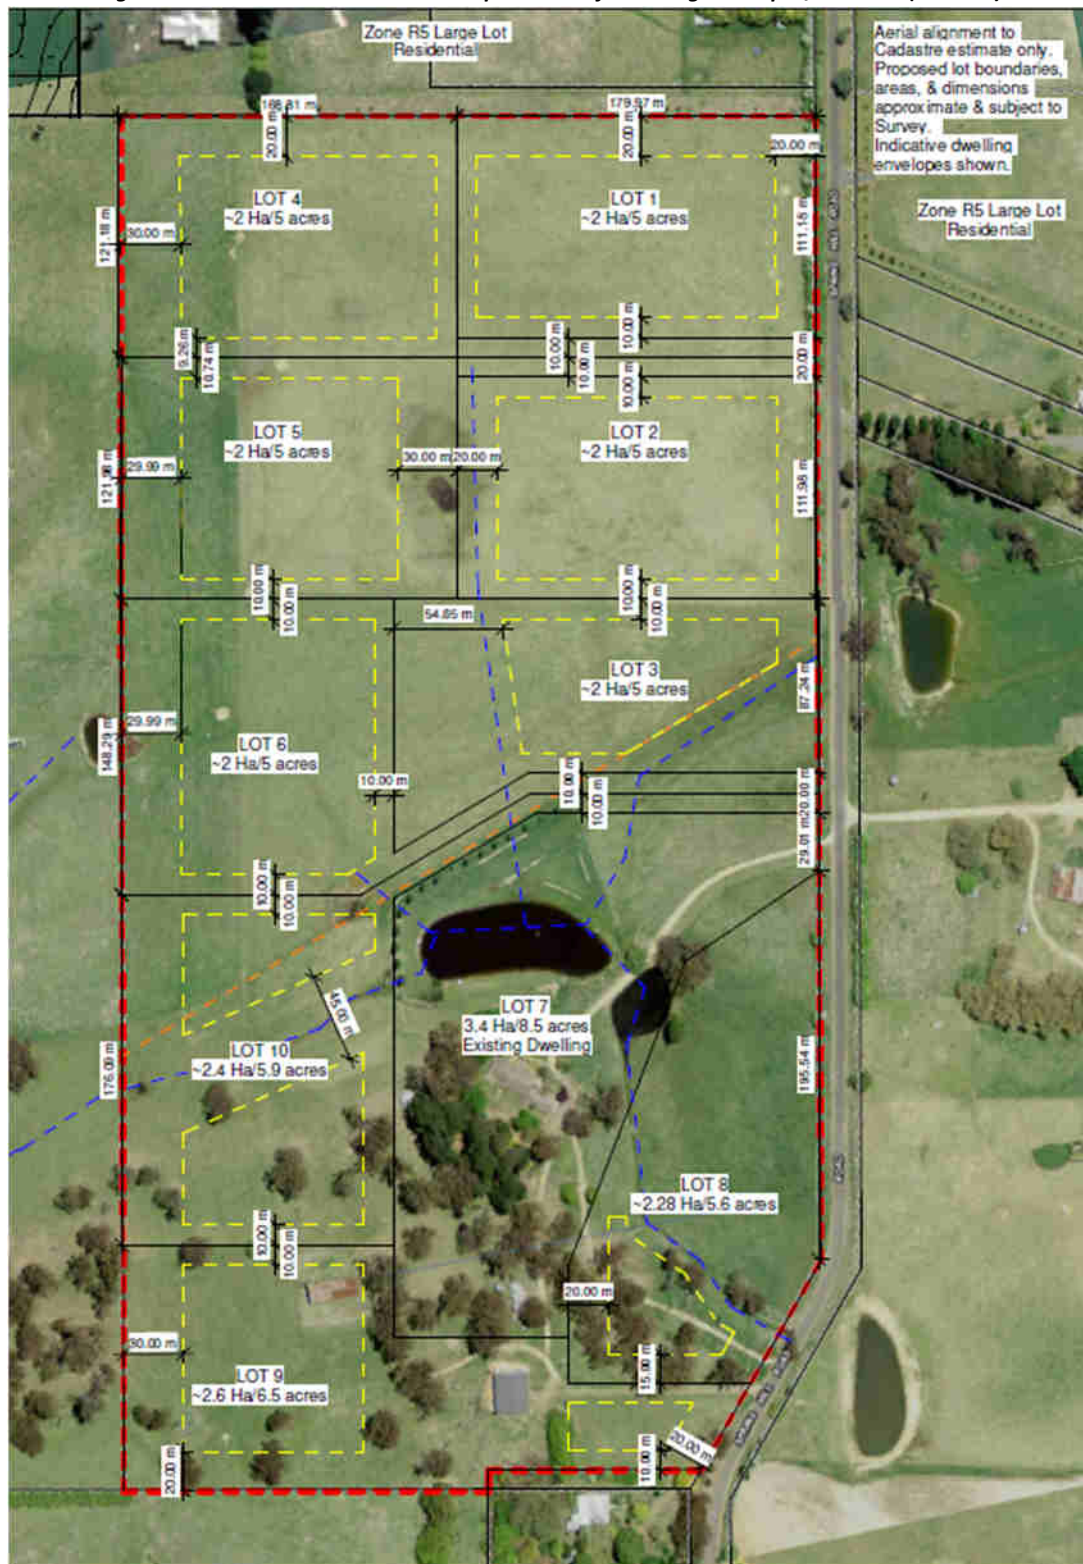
Indicative Subdivision Concept with Draft Building Envelopes/Setbacks (2ha lots).
